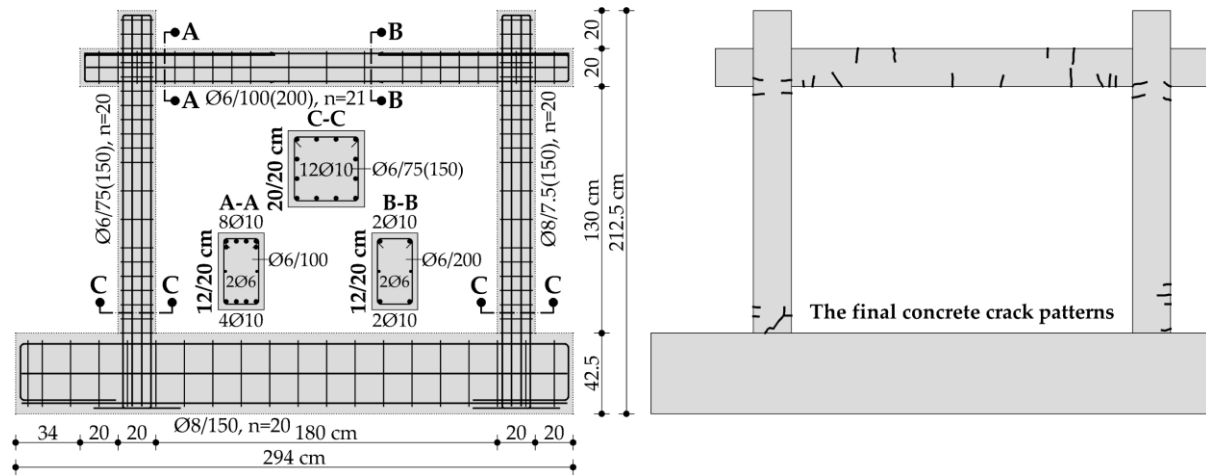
Schematic representation of geometry, cross sections, and the amount of reinforcement (left) and crack development during the cyclic test (right).
